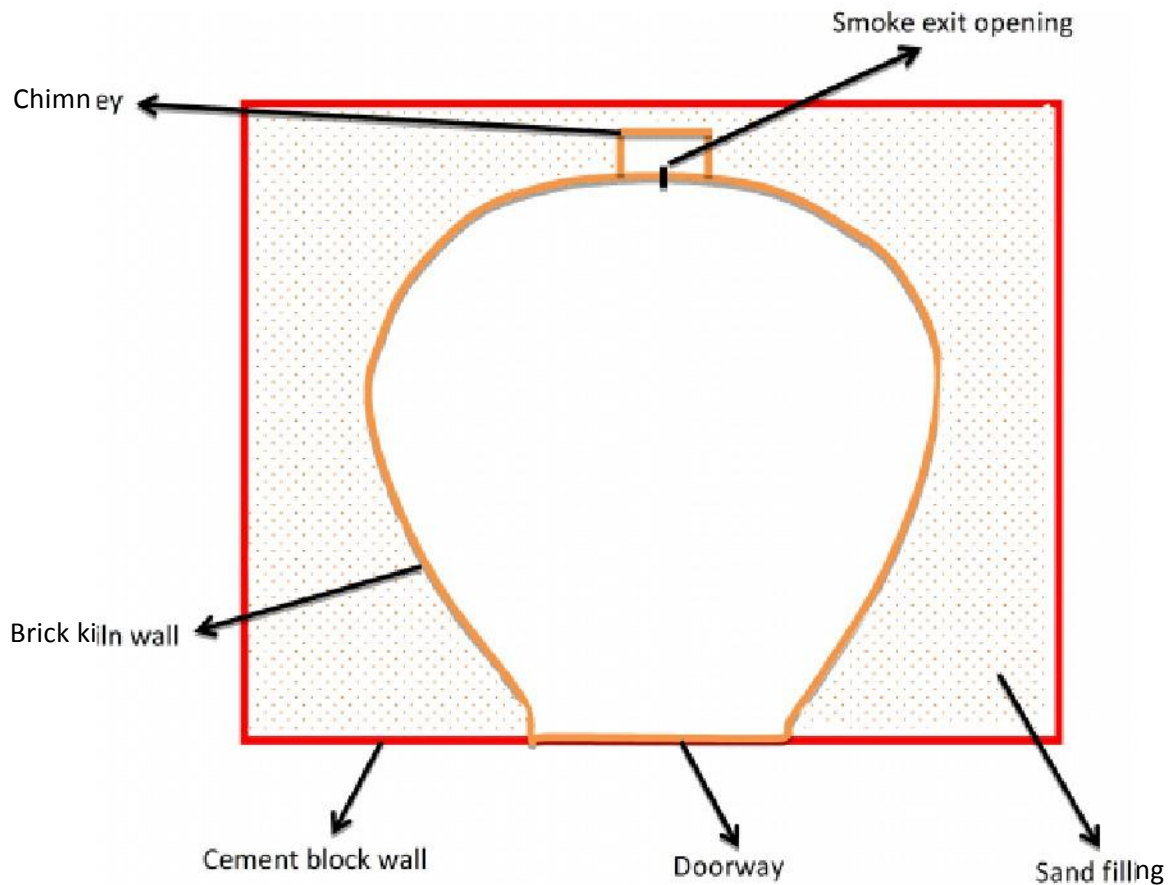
Aerial view of the kiln showing the doorway, cement wall and sand filling
